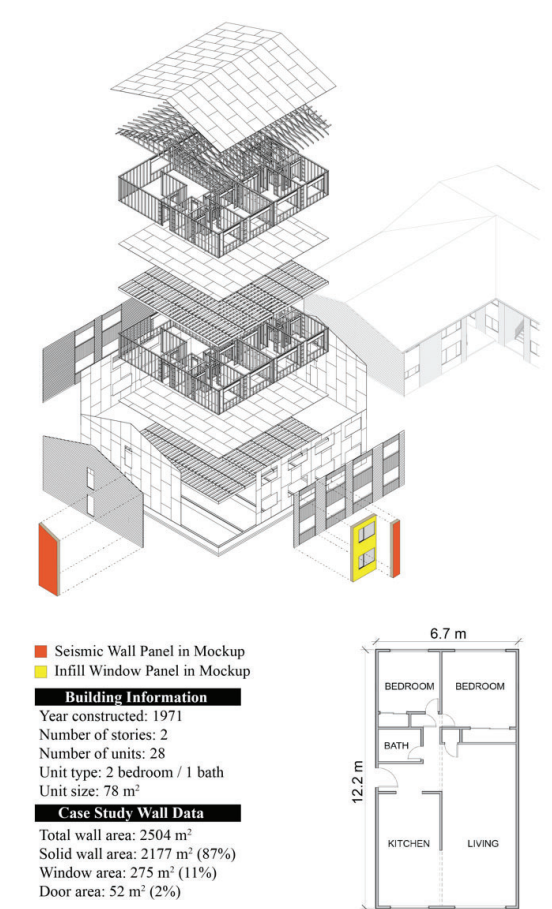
Case study multifamily building: building information, typical unit design, exploded view of existing light-wood frame structural system, wall area data and panels tested during mock-up.
